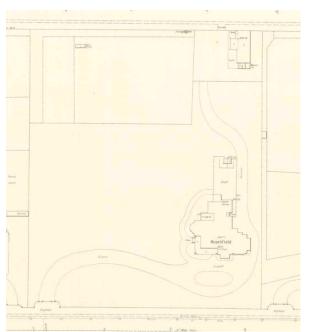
'Heathfield' and grounds in 1904. Note the Stables in the upper right-hand corner, fronting on to Rowland Street. (Source: MMBW Detail Plan No. 1569, 1904)
